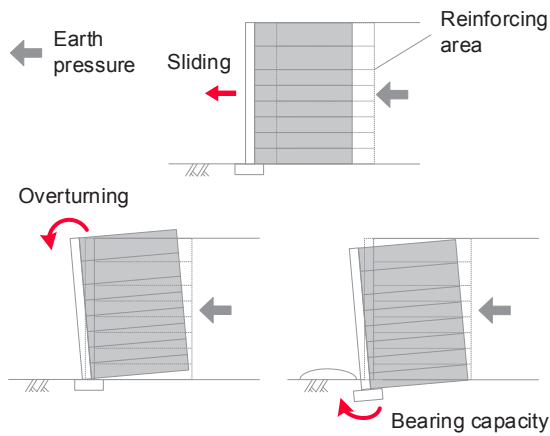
External stability in reinforced earth wall (Modified after PWRI, 2014).
